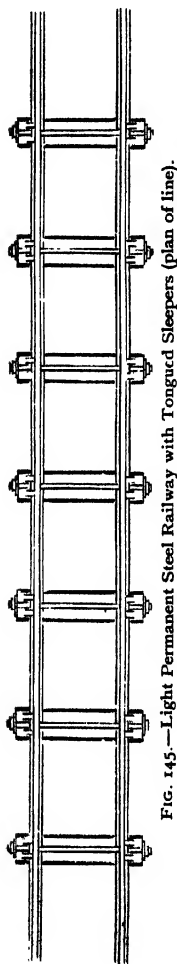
Light Permanent Steel Railway with Tongued Sleepers (plan of line).
